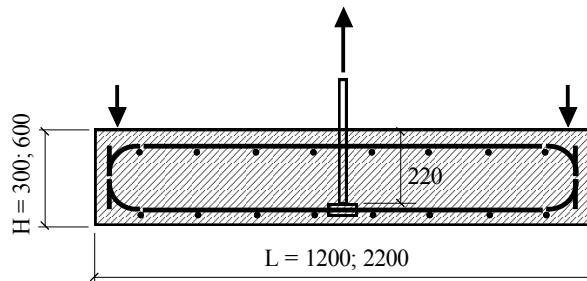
Concrete slab with cast-in threaded rod and nut, top and bottom reinforcement. Reaction forces at the top of the concrete slab indicate location of support ring [Nilsson and Elfgren 2009].
